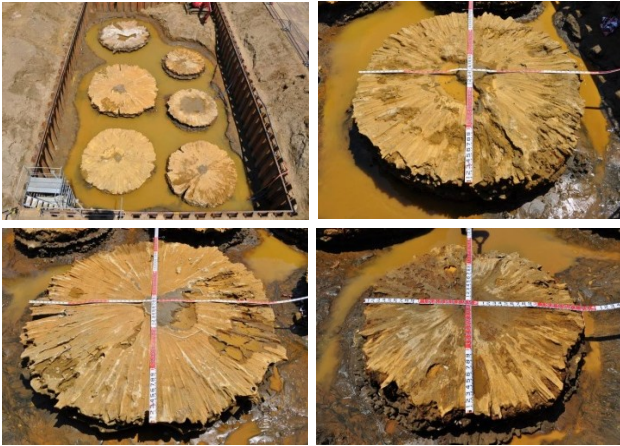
Excavated jet grouting (Shinsaka et al., 2013)
